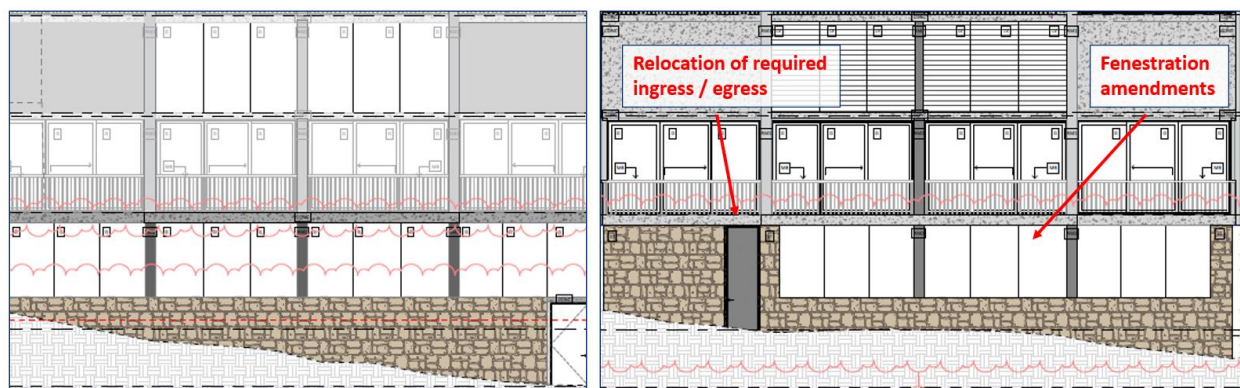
| Approved (left) and proposed (right) ingress / egress position on northern façade (Source: Department's Stamped Plans 2022 and Applicant's Statement of Environmental Effects [SEE] 2023)
